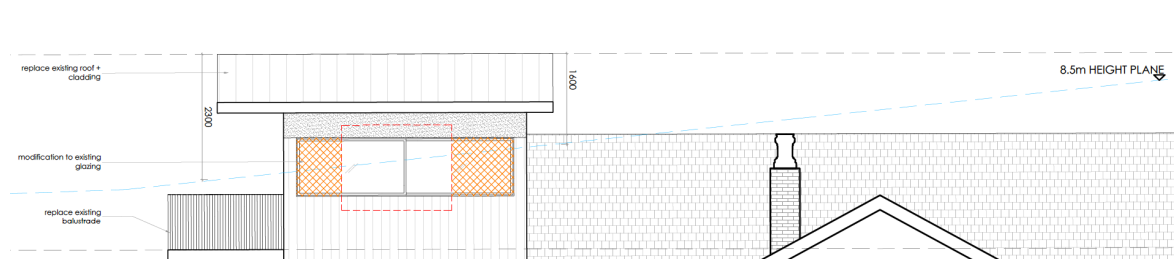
Proposed South Elevation Plan – proposed first floor in its identical footprint and height as existing.
